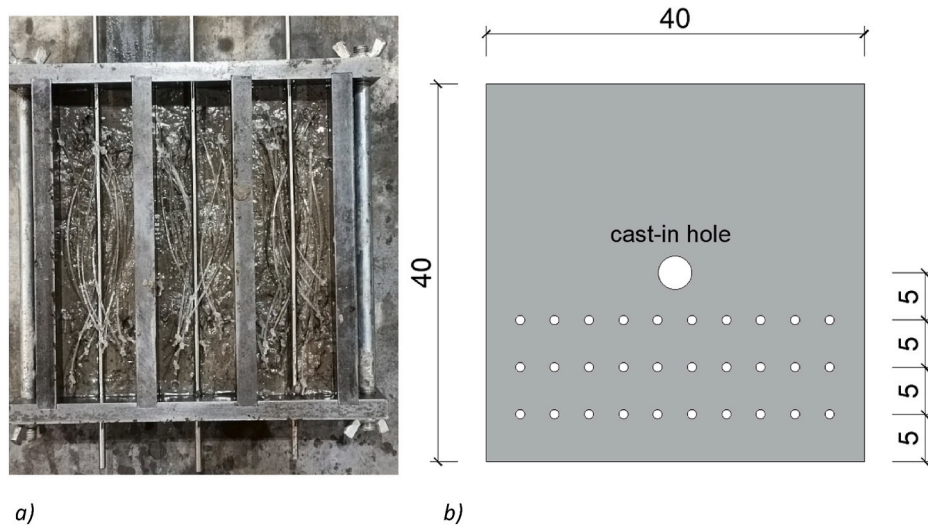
a) Casting of SMP samples with placement of an oiled steel rod for water flow testing, and b) sketch of cross-section of SMP specimen with cast-in hole (after removal of steel rod) (measurements in mm).
